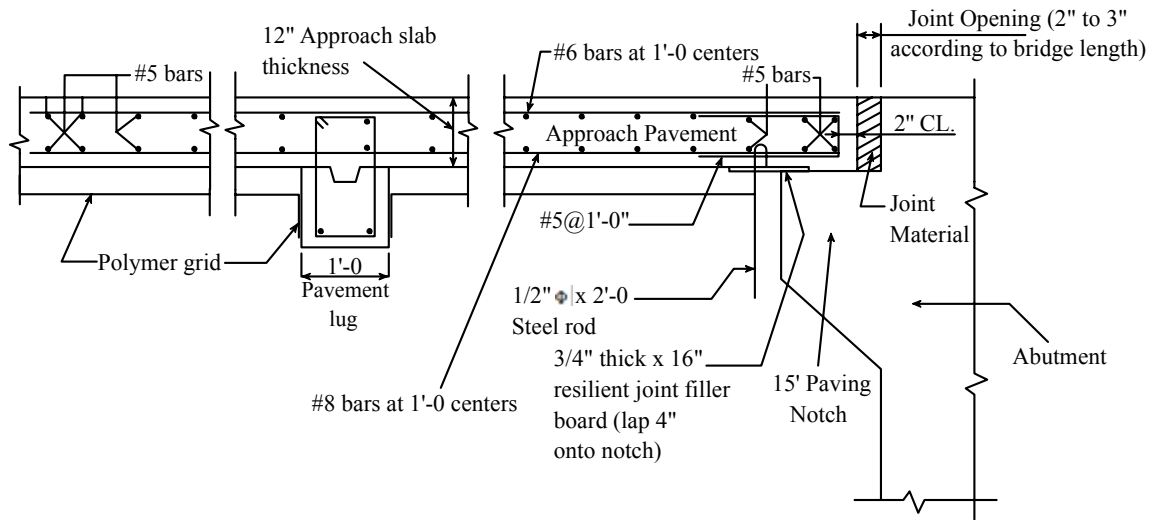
Bridge approach resting on paving notch (Iowa DOT 2004)
